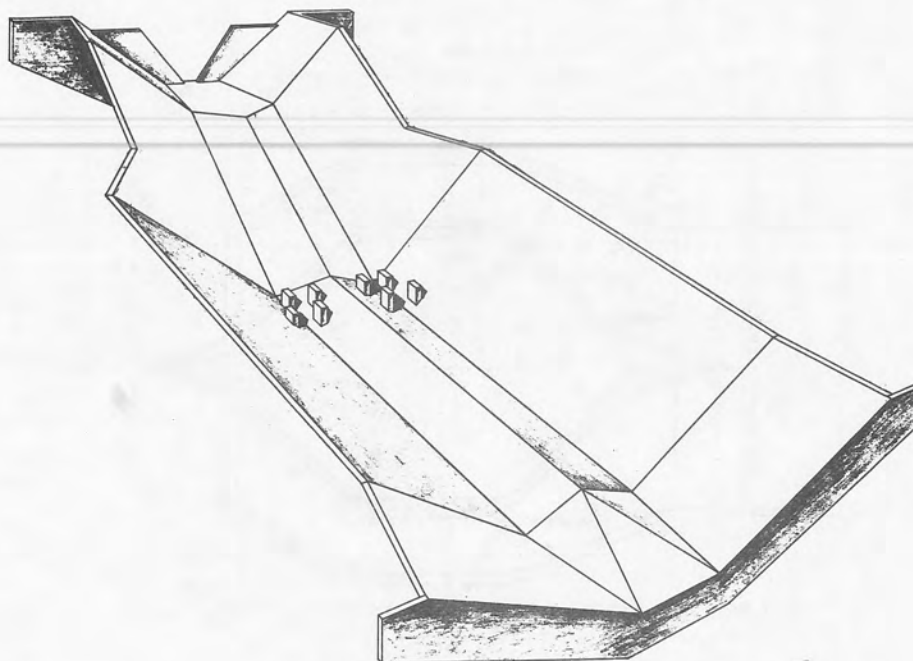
Perspective view of trapezoidal concrete drops--Sand Hollow Wasteway--Boise Project.
